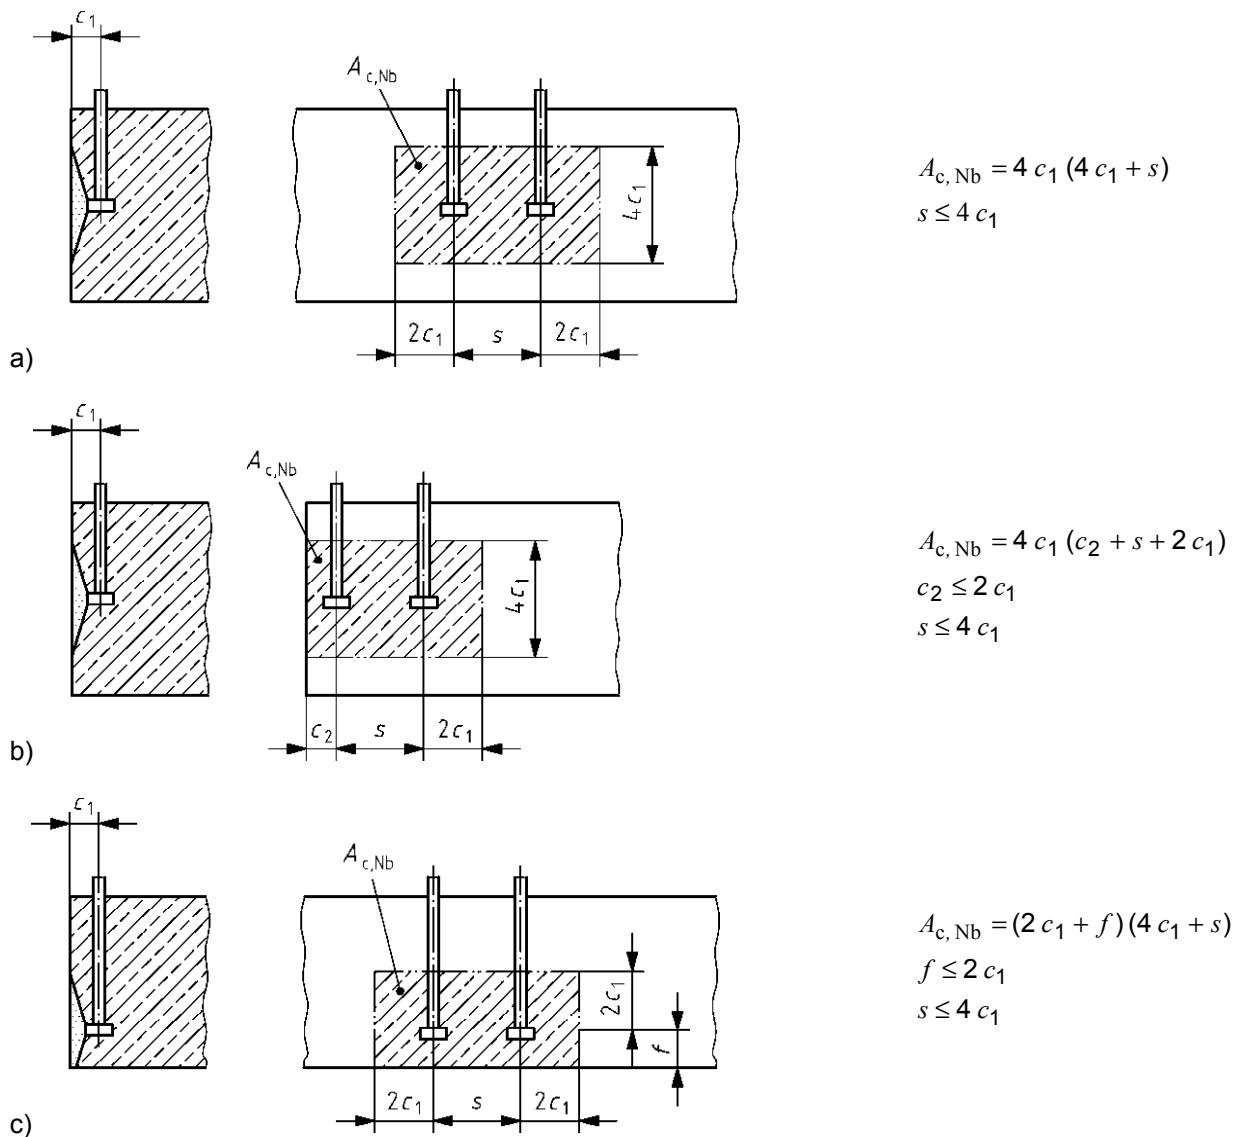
Examples of actual areas A_c , N_b of the idealised concrete break-out bodies for different arrangements of fasteners in case of blow-out
